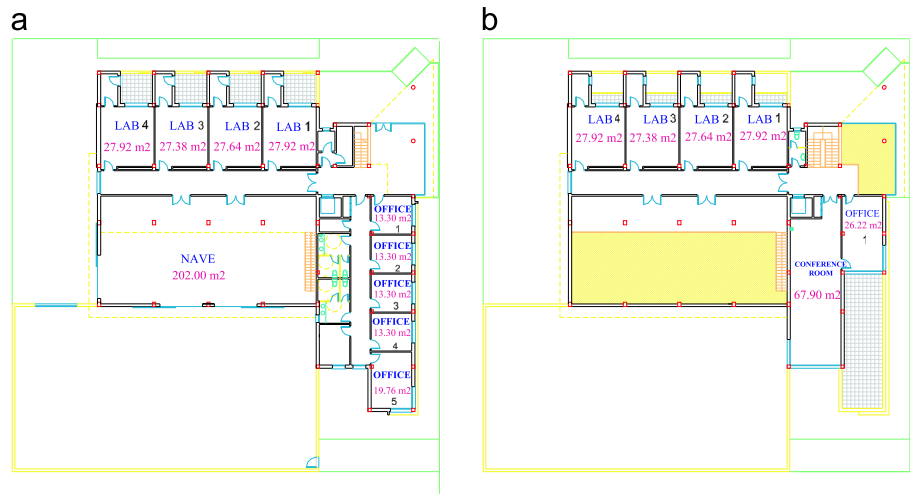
(a) CIESOL ground floor plan and (b) CIESOL first floor plan.
